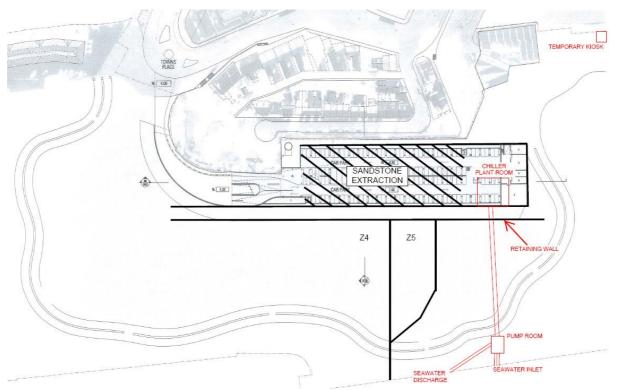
Sea Water Cooling Concept Plan (Source: Soil and Water Report, WSP Environment & Energy, Oct. 2010)
